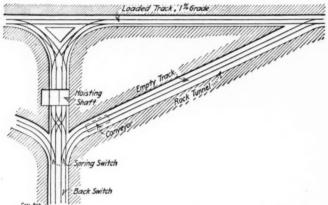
PROPOSED PLAN FOR LOADED AND EMPTY TRACKS AT LANDINGS UNDERGROUND
